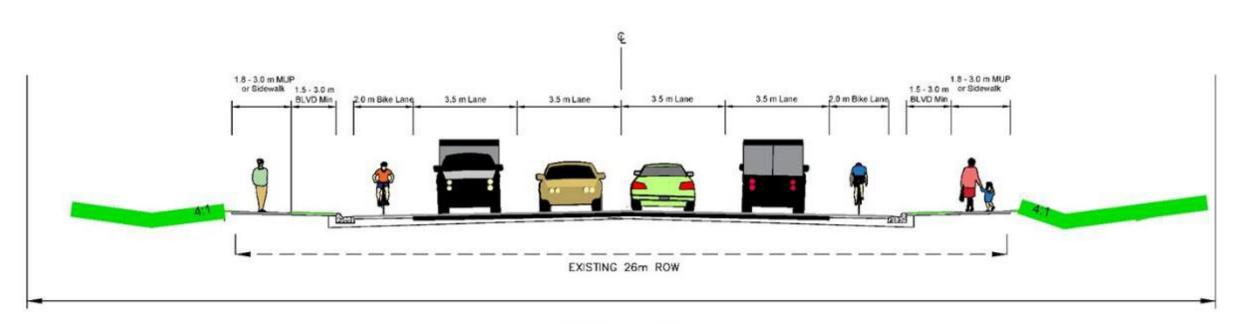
Section 2 Alternative 5 - 4-Lane Rural Cross Section
